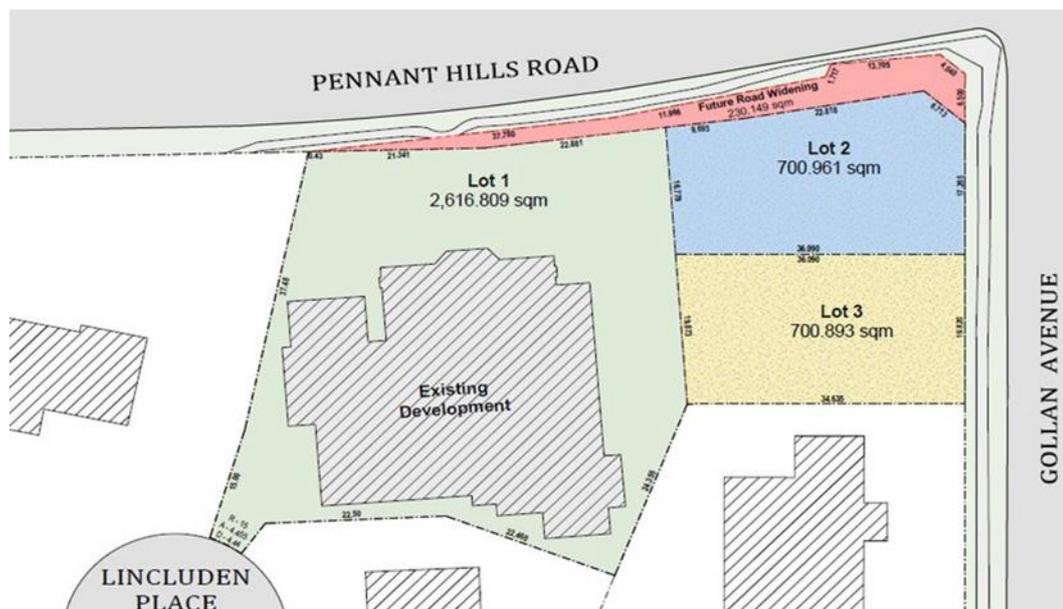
Indicative subdivision plan for the site at 8 Lincluden Place, Oatlands
